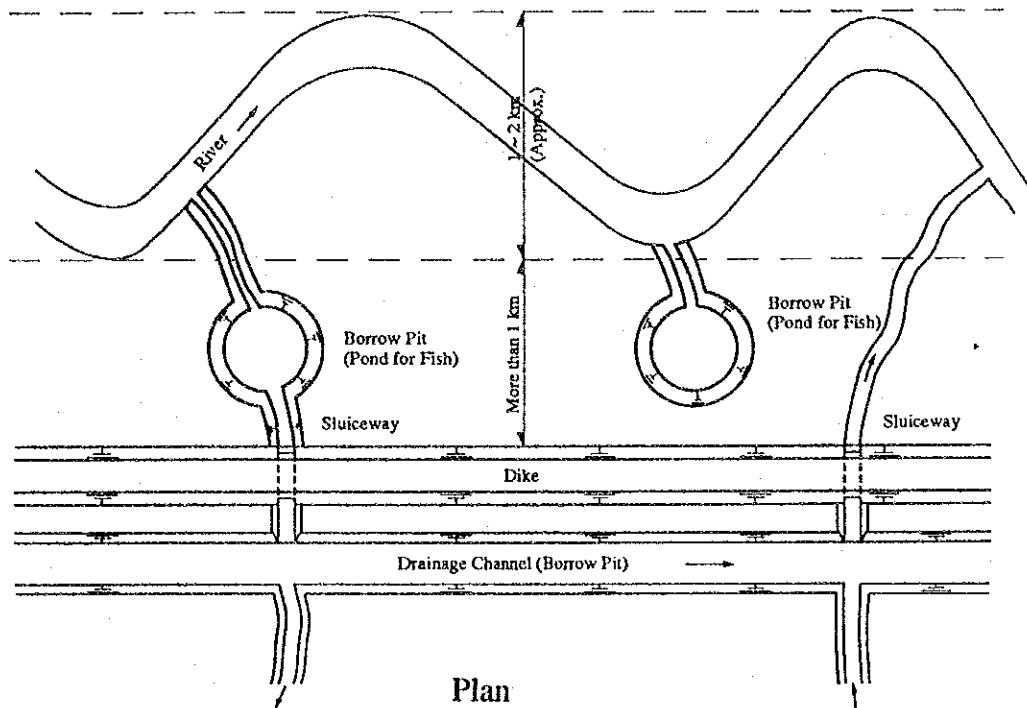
Typical Arrangement of Dike, Borrow Pit and Sluiceway
